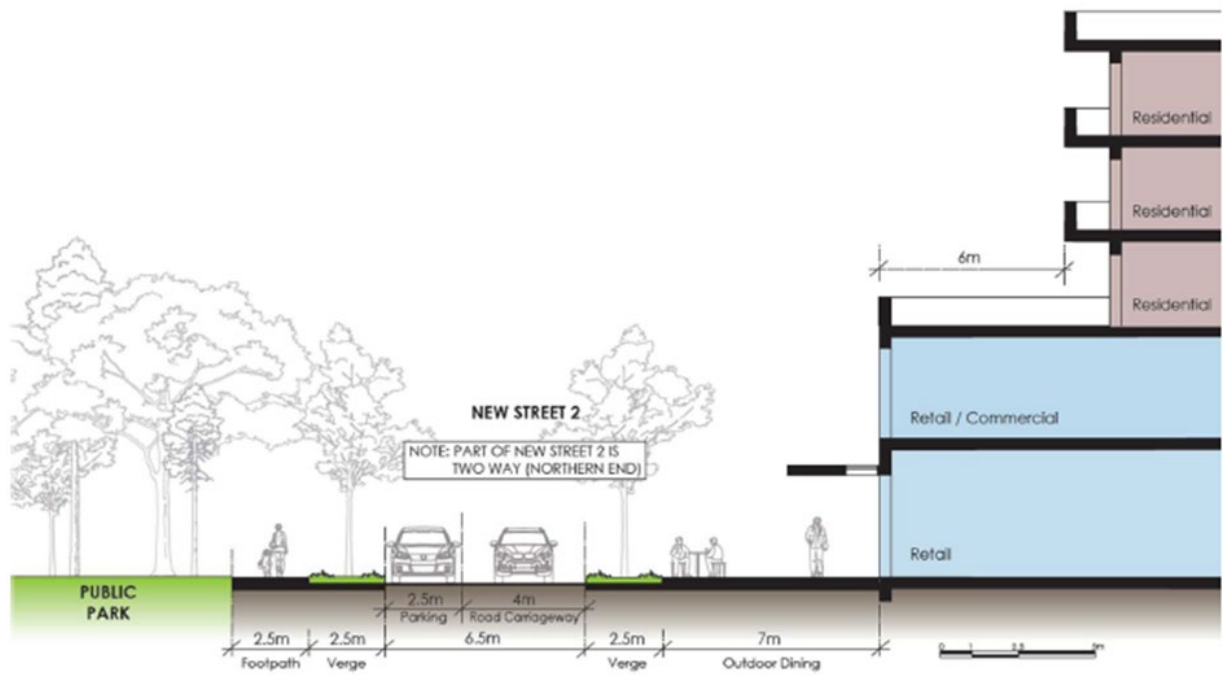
New Street 2 Setbacks - Southern End - Section D-D
